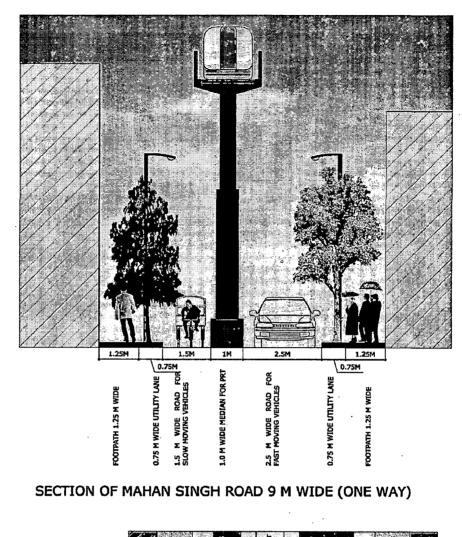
Traffic Management - one way roads and restricted entry roads (Source: By Author)
